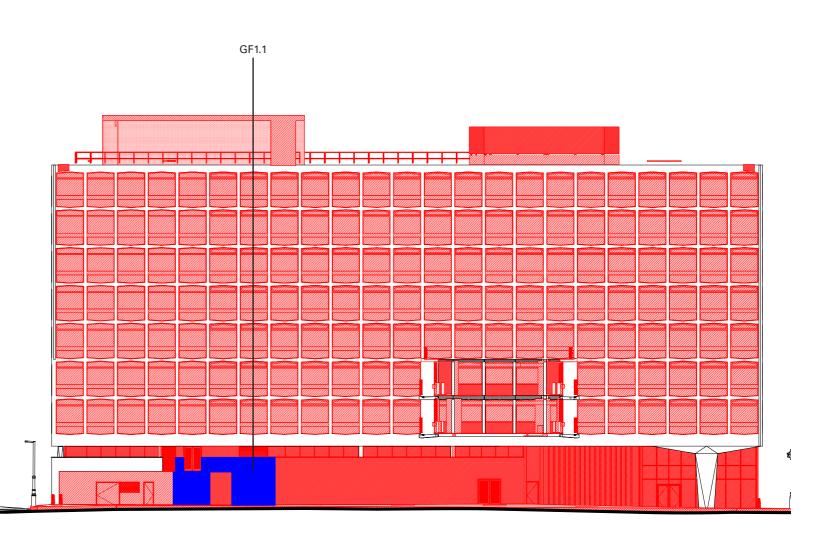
Consented Ground Floor Plan - Loading Bay Wall Location
